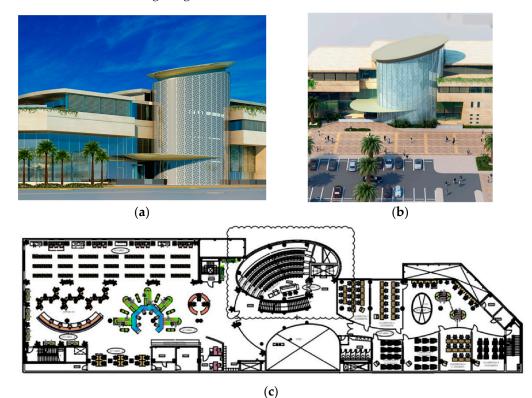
(a–c) Building's exterior view and plan layout. (a) Exterior view of the building showing shading elements on elevation. (b) Exterior view of the building showing exterior pedestrian and car parking on elevation. (c) The second-floor plan for the university building shows the classrooms on the right side and the main library on the left side.
